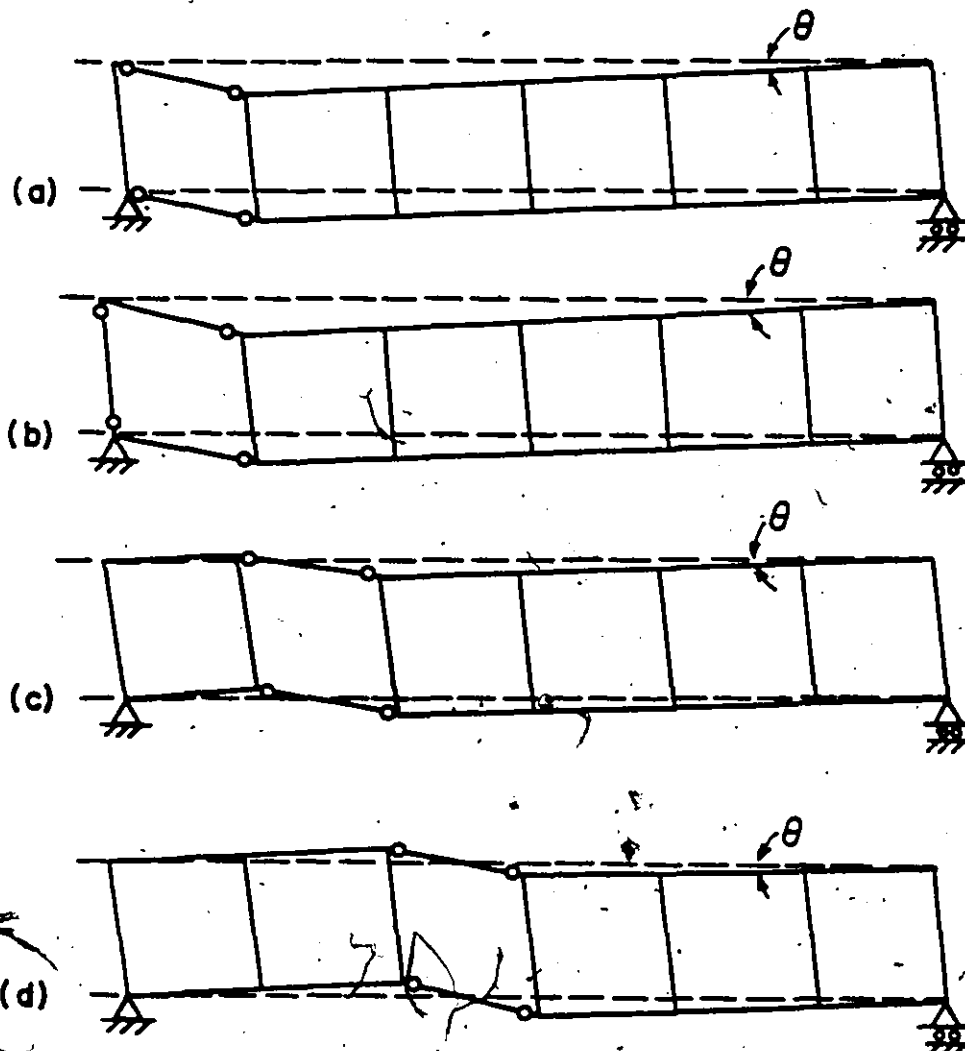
POSSIBLE FAILURE MECHANISMS FOR VIERENDEEL TRUSSES
